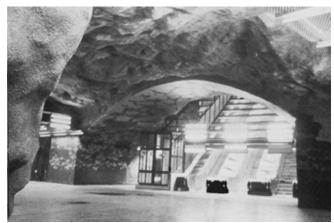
SFRS final tunnel lining of underground metro (passenger railway station) in Stockholm, Sweden.
